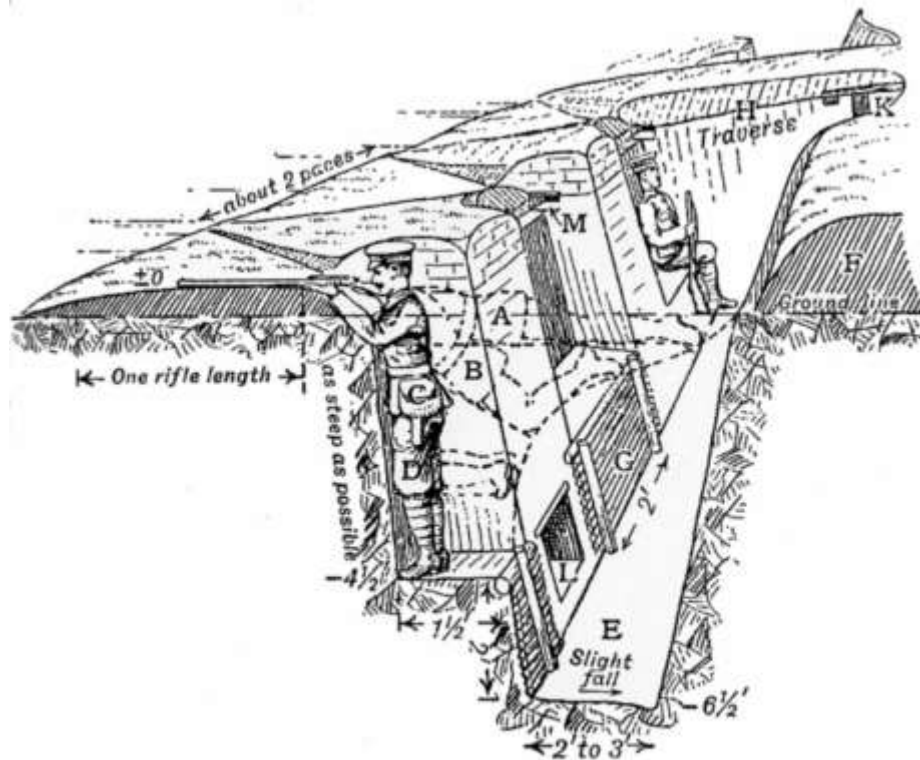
Instruction diagram for constructing a reveted fire-trench with bays and traverses (from Solano 1914)
